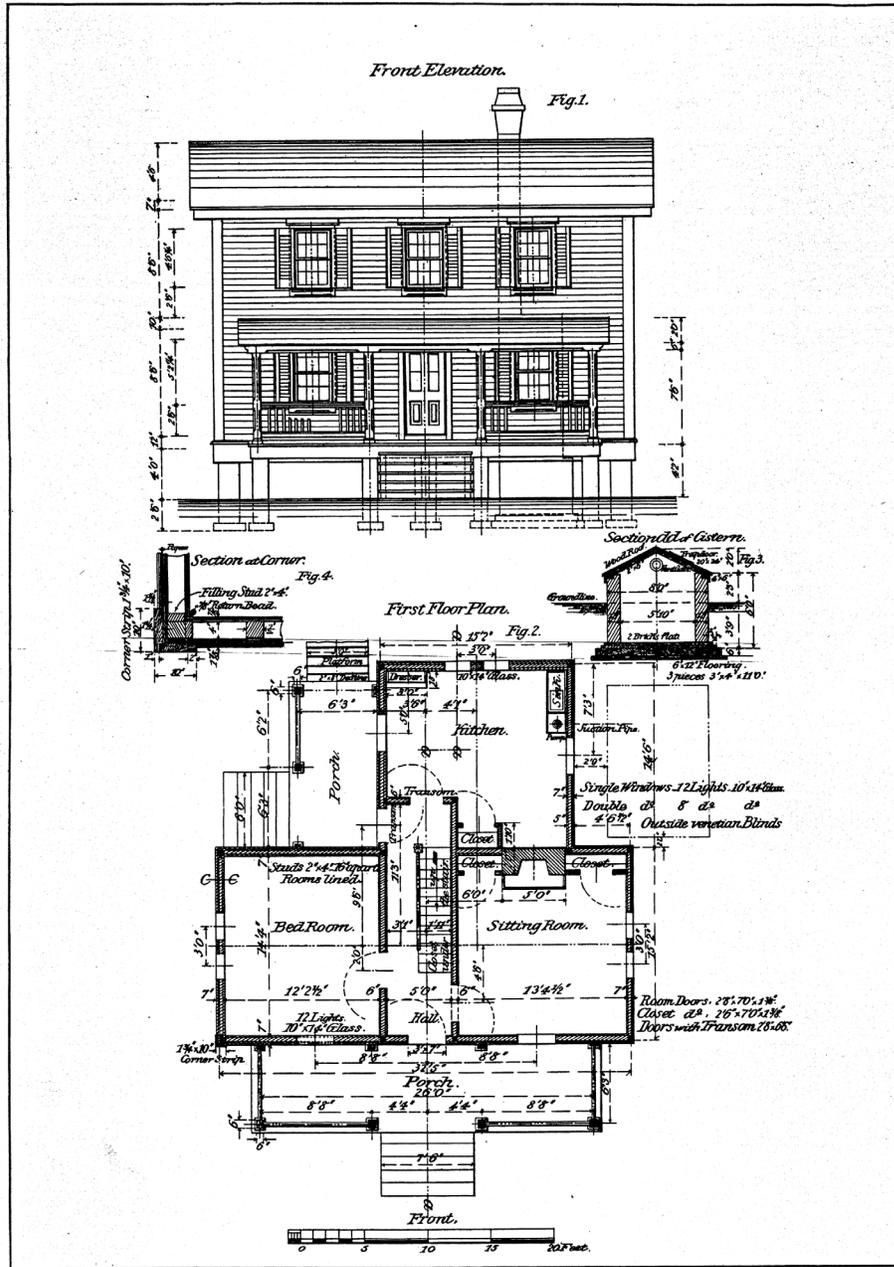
Original front elevation and first floor plan, planned for Bodie Island but actually built at Cape Lookout. (U.S Coast Guard, 1907)
